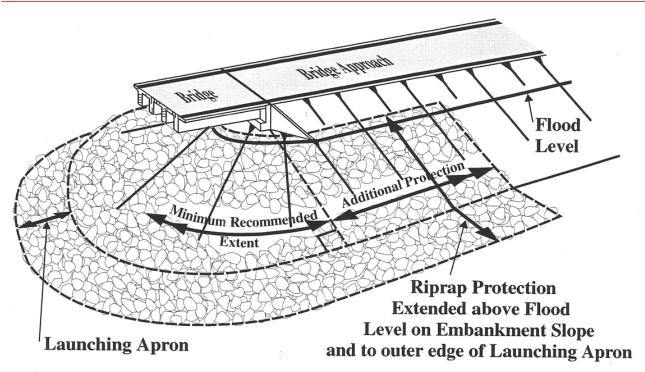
Recommended practice for the placement of riprap protection at bridge abutments (Source: Fig 9.29 in Melville and Coleman (2000)).
